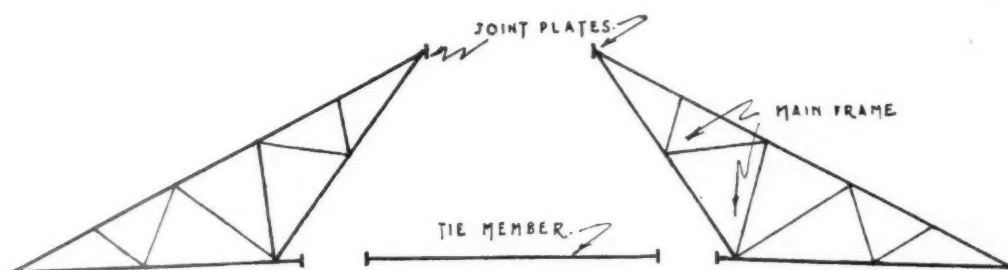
Composite roof truss for spans ranging from 15' to 40'.
